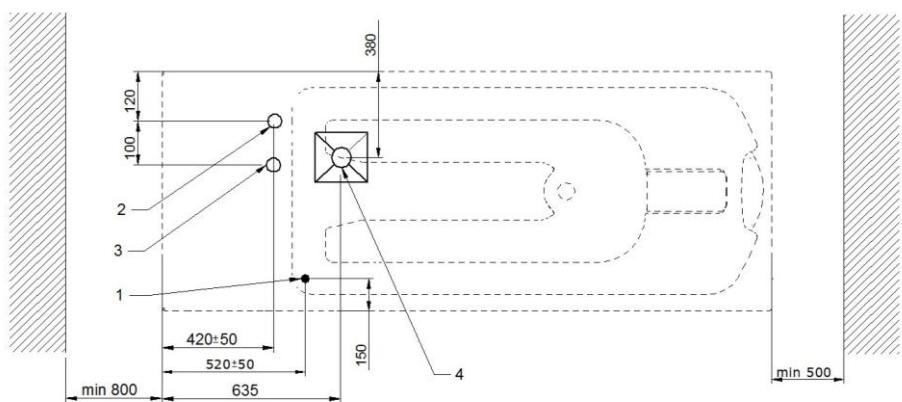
ORIONMED bathtub layout of media outlets in the floor (dimensions in mm)
